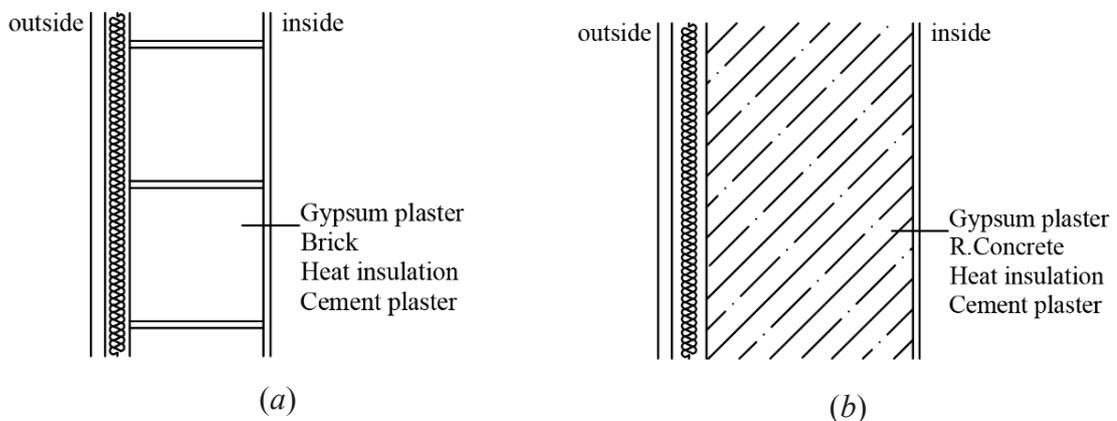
Exterior brick wall (a) and reinforced concrete wall (b) construction
